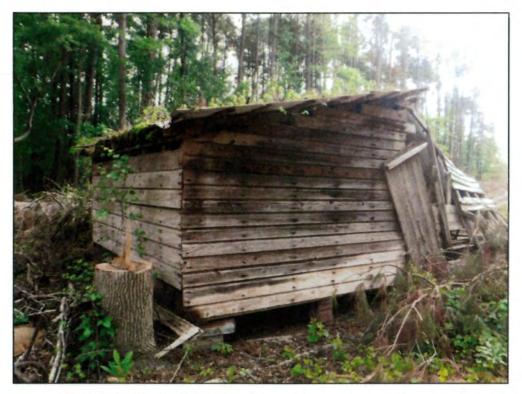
CD1481, Outbuilding 2 oblique of the south and west elevations, facing northeast.
